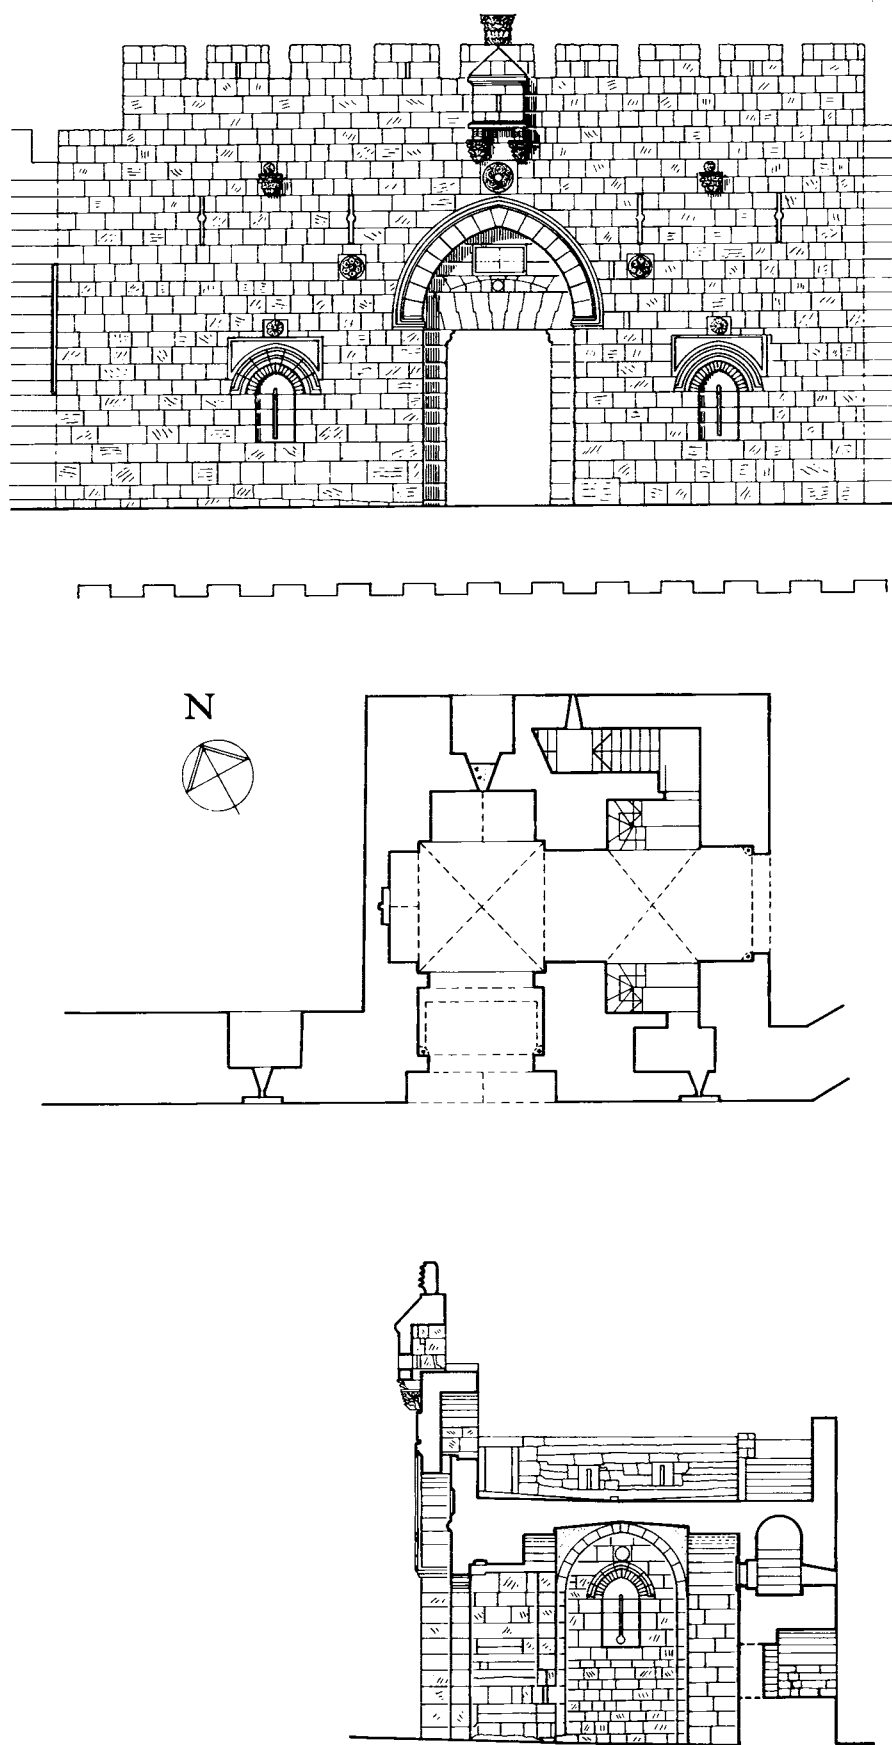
Zion Gate (Bab al-Nabi Da'ud) (F)—South elevation; ground plan; and NS section.
